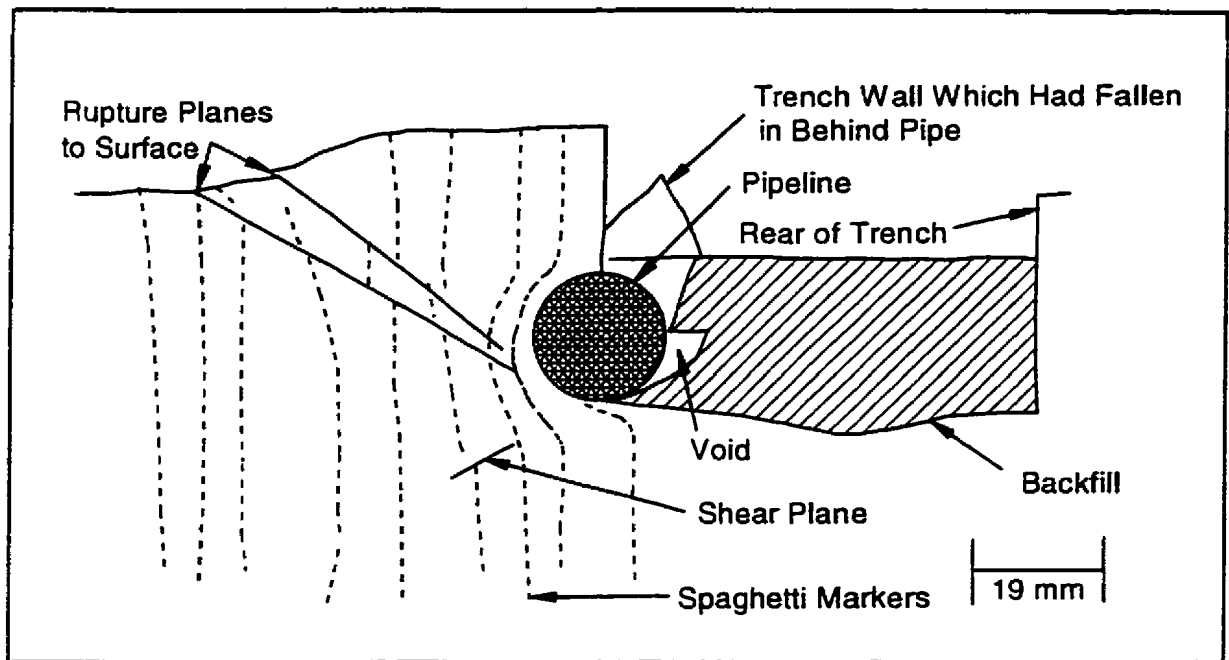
Sketch of excavated cross-section along mid length of model pipeline #1, 0.00055mm/sec, Test 08.
